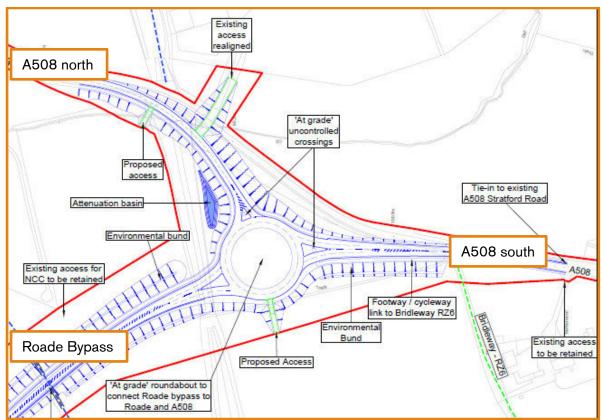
A508 Stratford Road/Roade Bypass 3-arm roundabout
